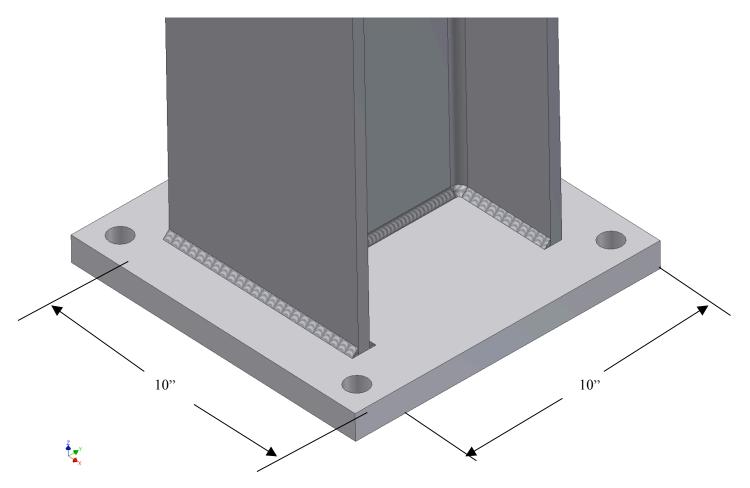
Base plate geometry. The column is has a 3/8" fillet weld all around. The plate is connected to the floor with 7/8" threaded rod.
